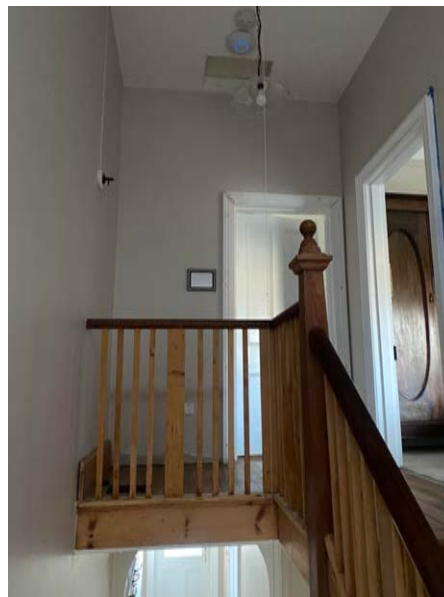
Stair balustrade and Newel Source: carste STUDIO
